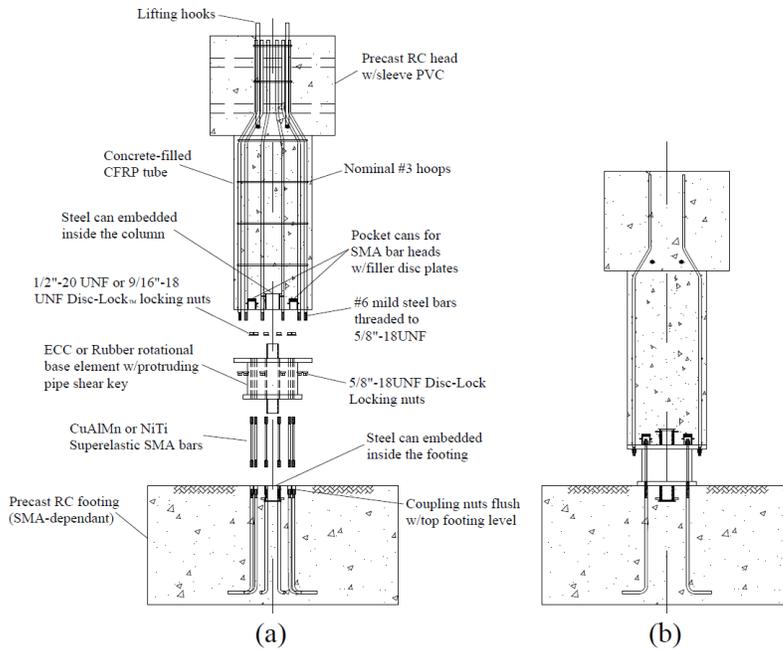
DfD column concept. (a) Exploded view (b) Assembled column.
